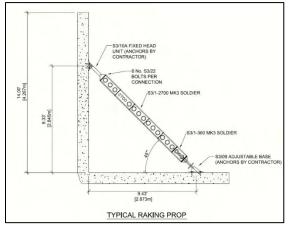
System 160 Elevation (Image supplied by Mabey Bridge & Shore, Inc.)
